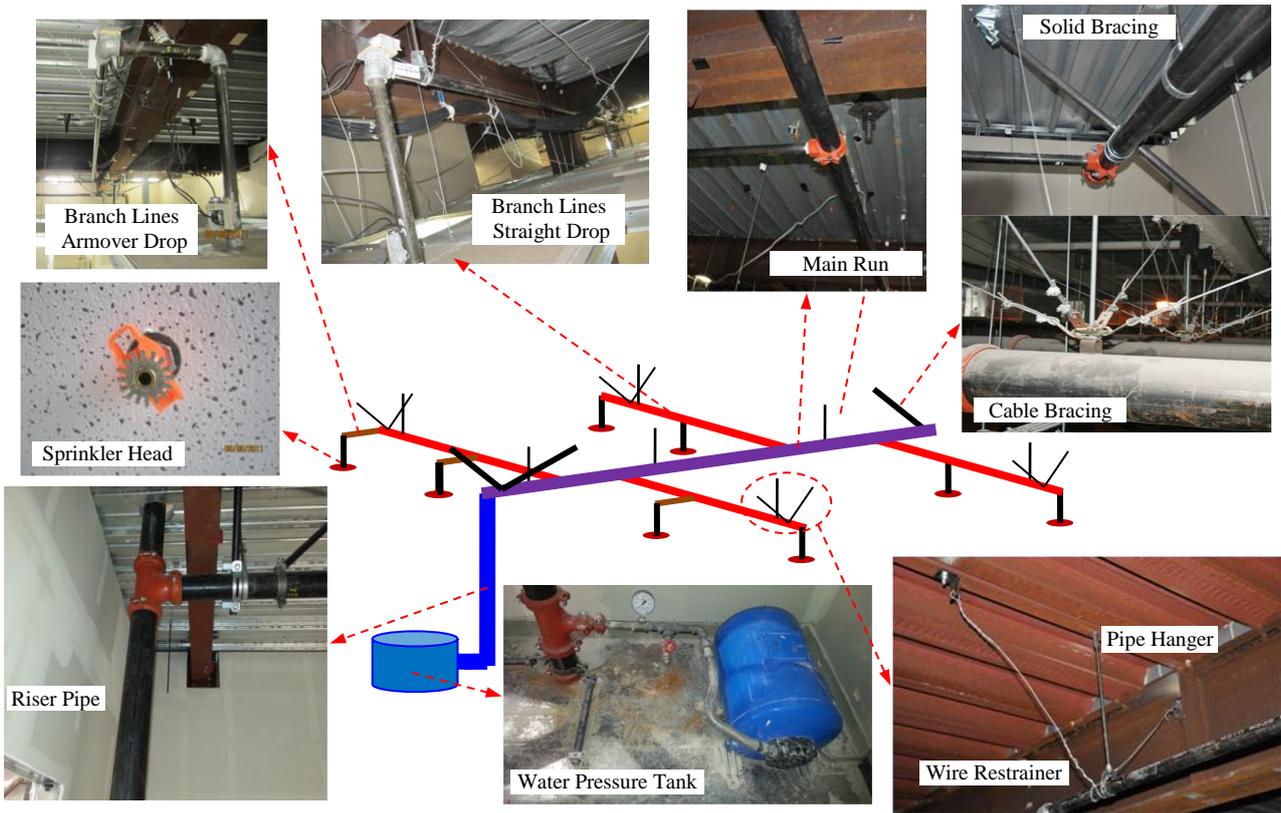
Typical layout and elements of a fire sprinkler piping system.
